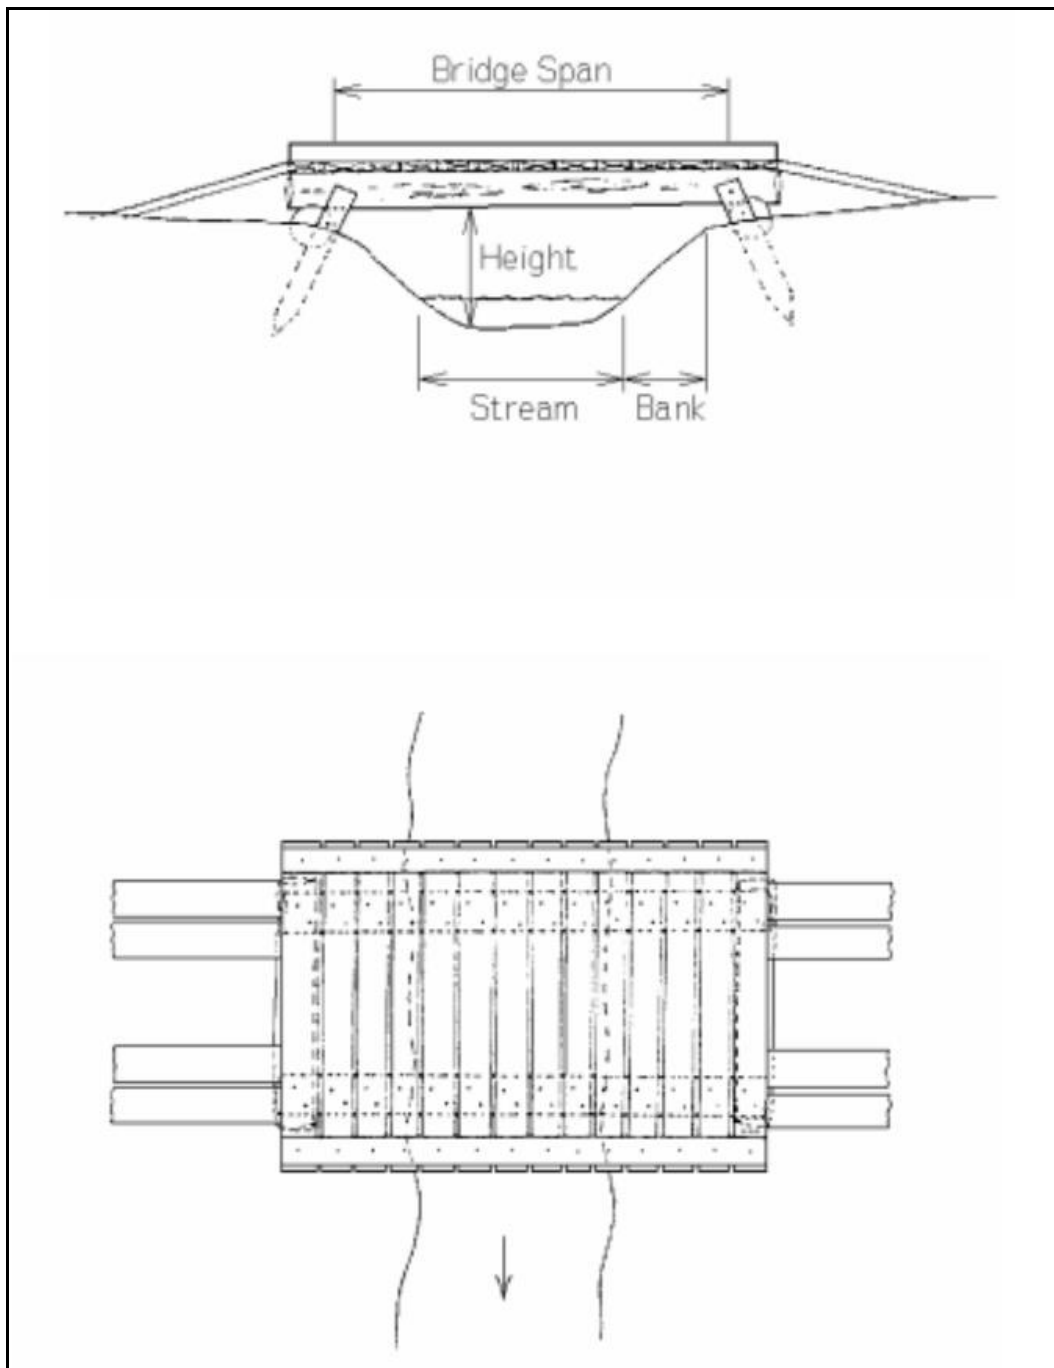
A.1 Profile and Plan of a Simple ATV Bridge
